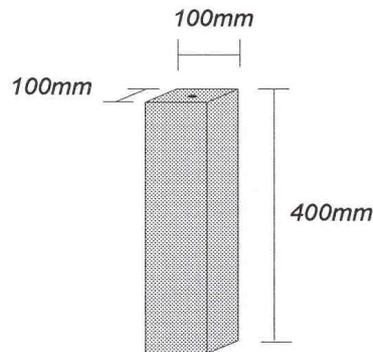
SYLVAC: measuring points and dimensions of the test specimens.
